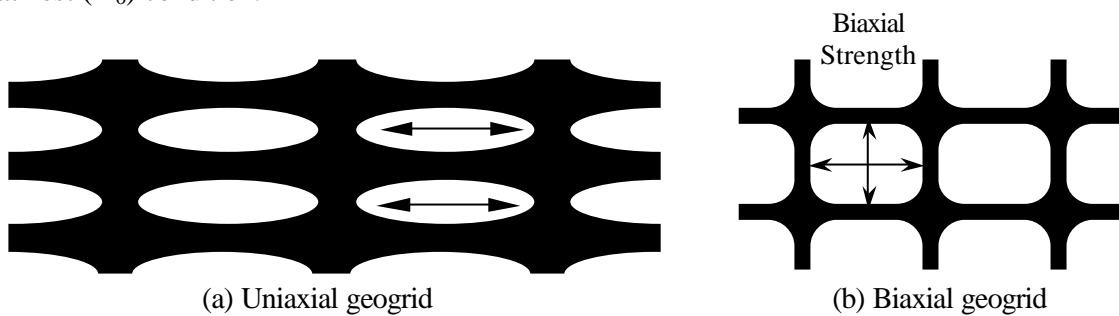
Typical geogrids used as soil reinforcements (John, 1987).
